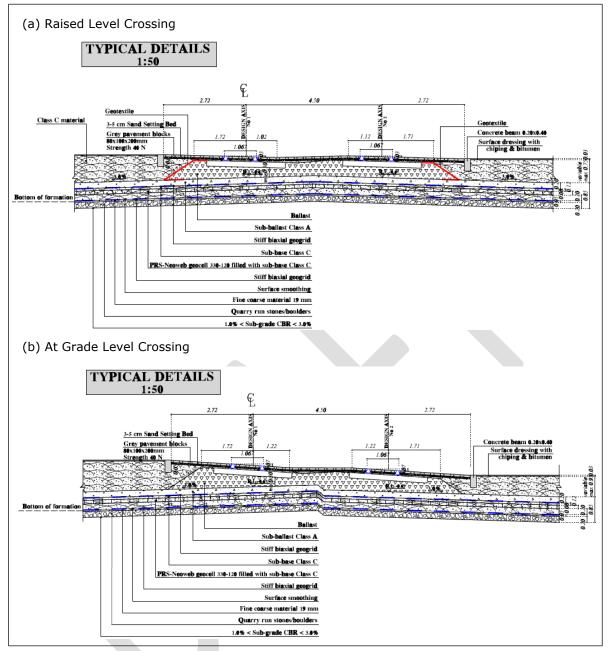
Typical Level Crossing Cross Section (a) Raised and (b) At Grade
